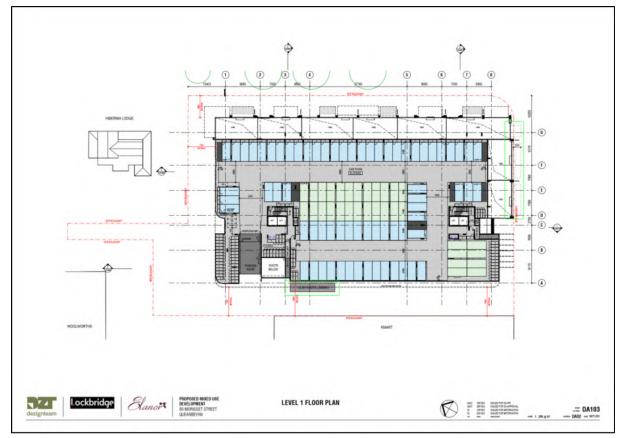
below, presents an overview of the ground and first floors of the proposed development. A full set of the plans is provided at Appendix D.
